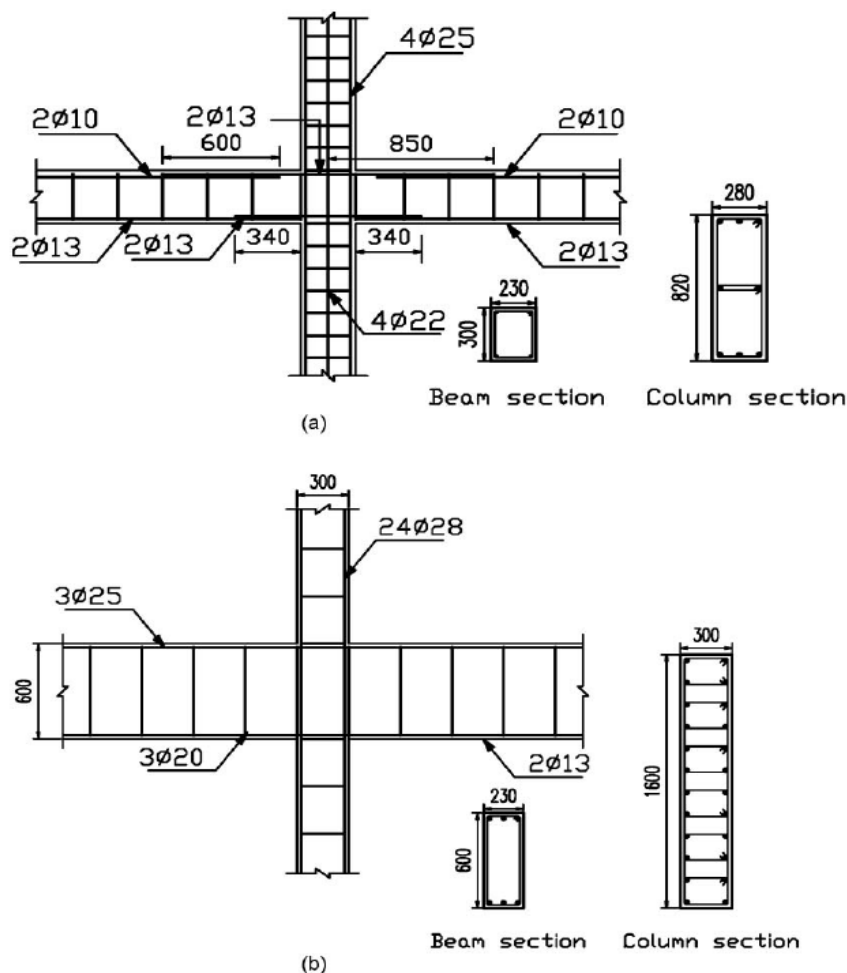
Cross Sectional Details for RC Beam Column Joints
